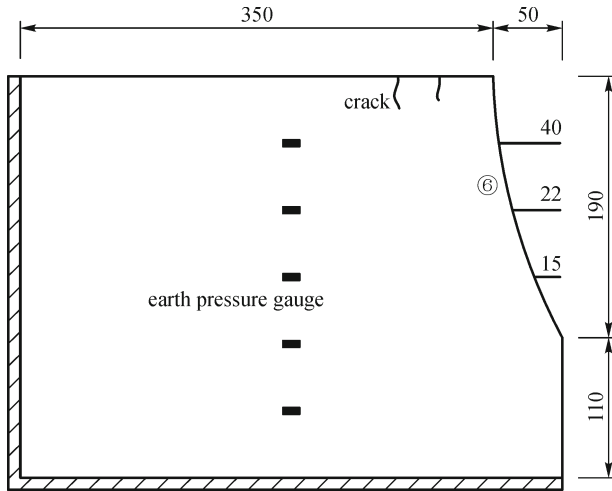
Final failure shape of A-A cross-section with bolt reinforcement in case 4 (unit: mm)
